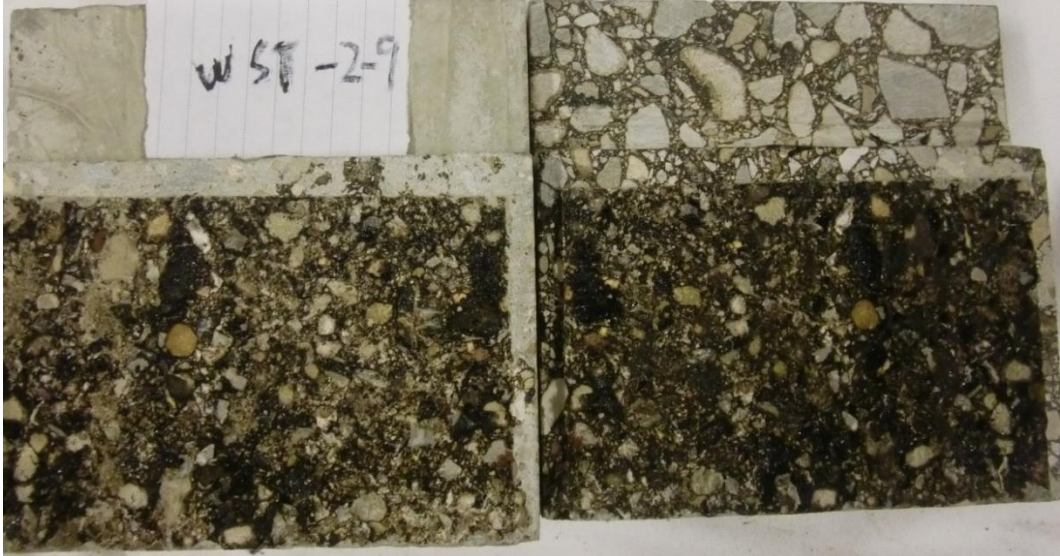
Failure surfaces of milled, dry and room-temperature specimen, WST-2-09.
